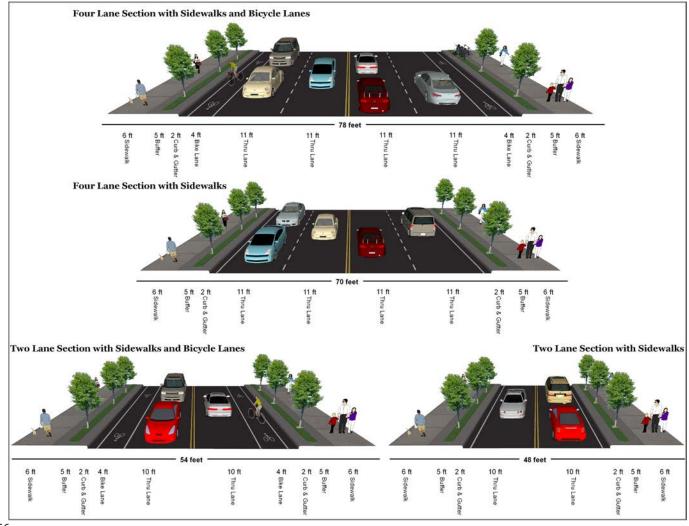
Toco Hill Node Redevelopment Street Menu of Recommended Typical Sections
